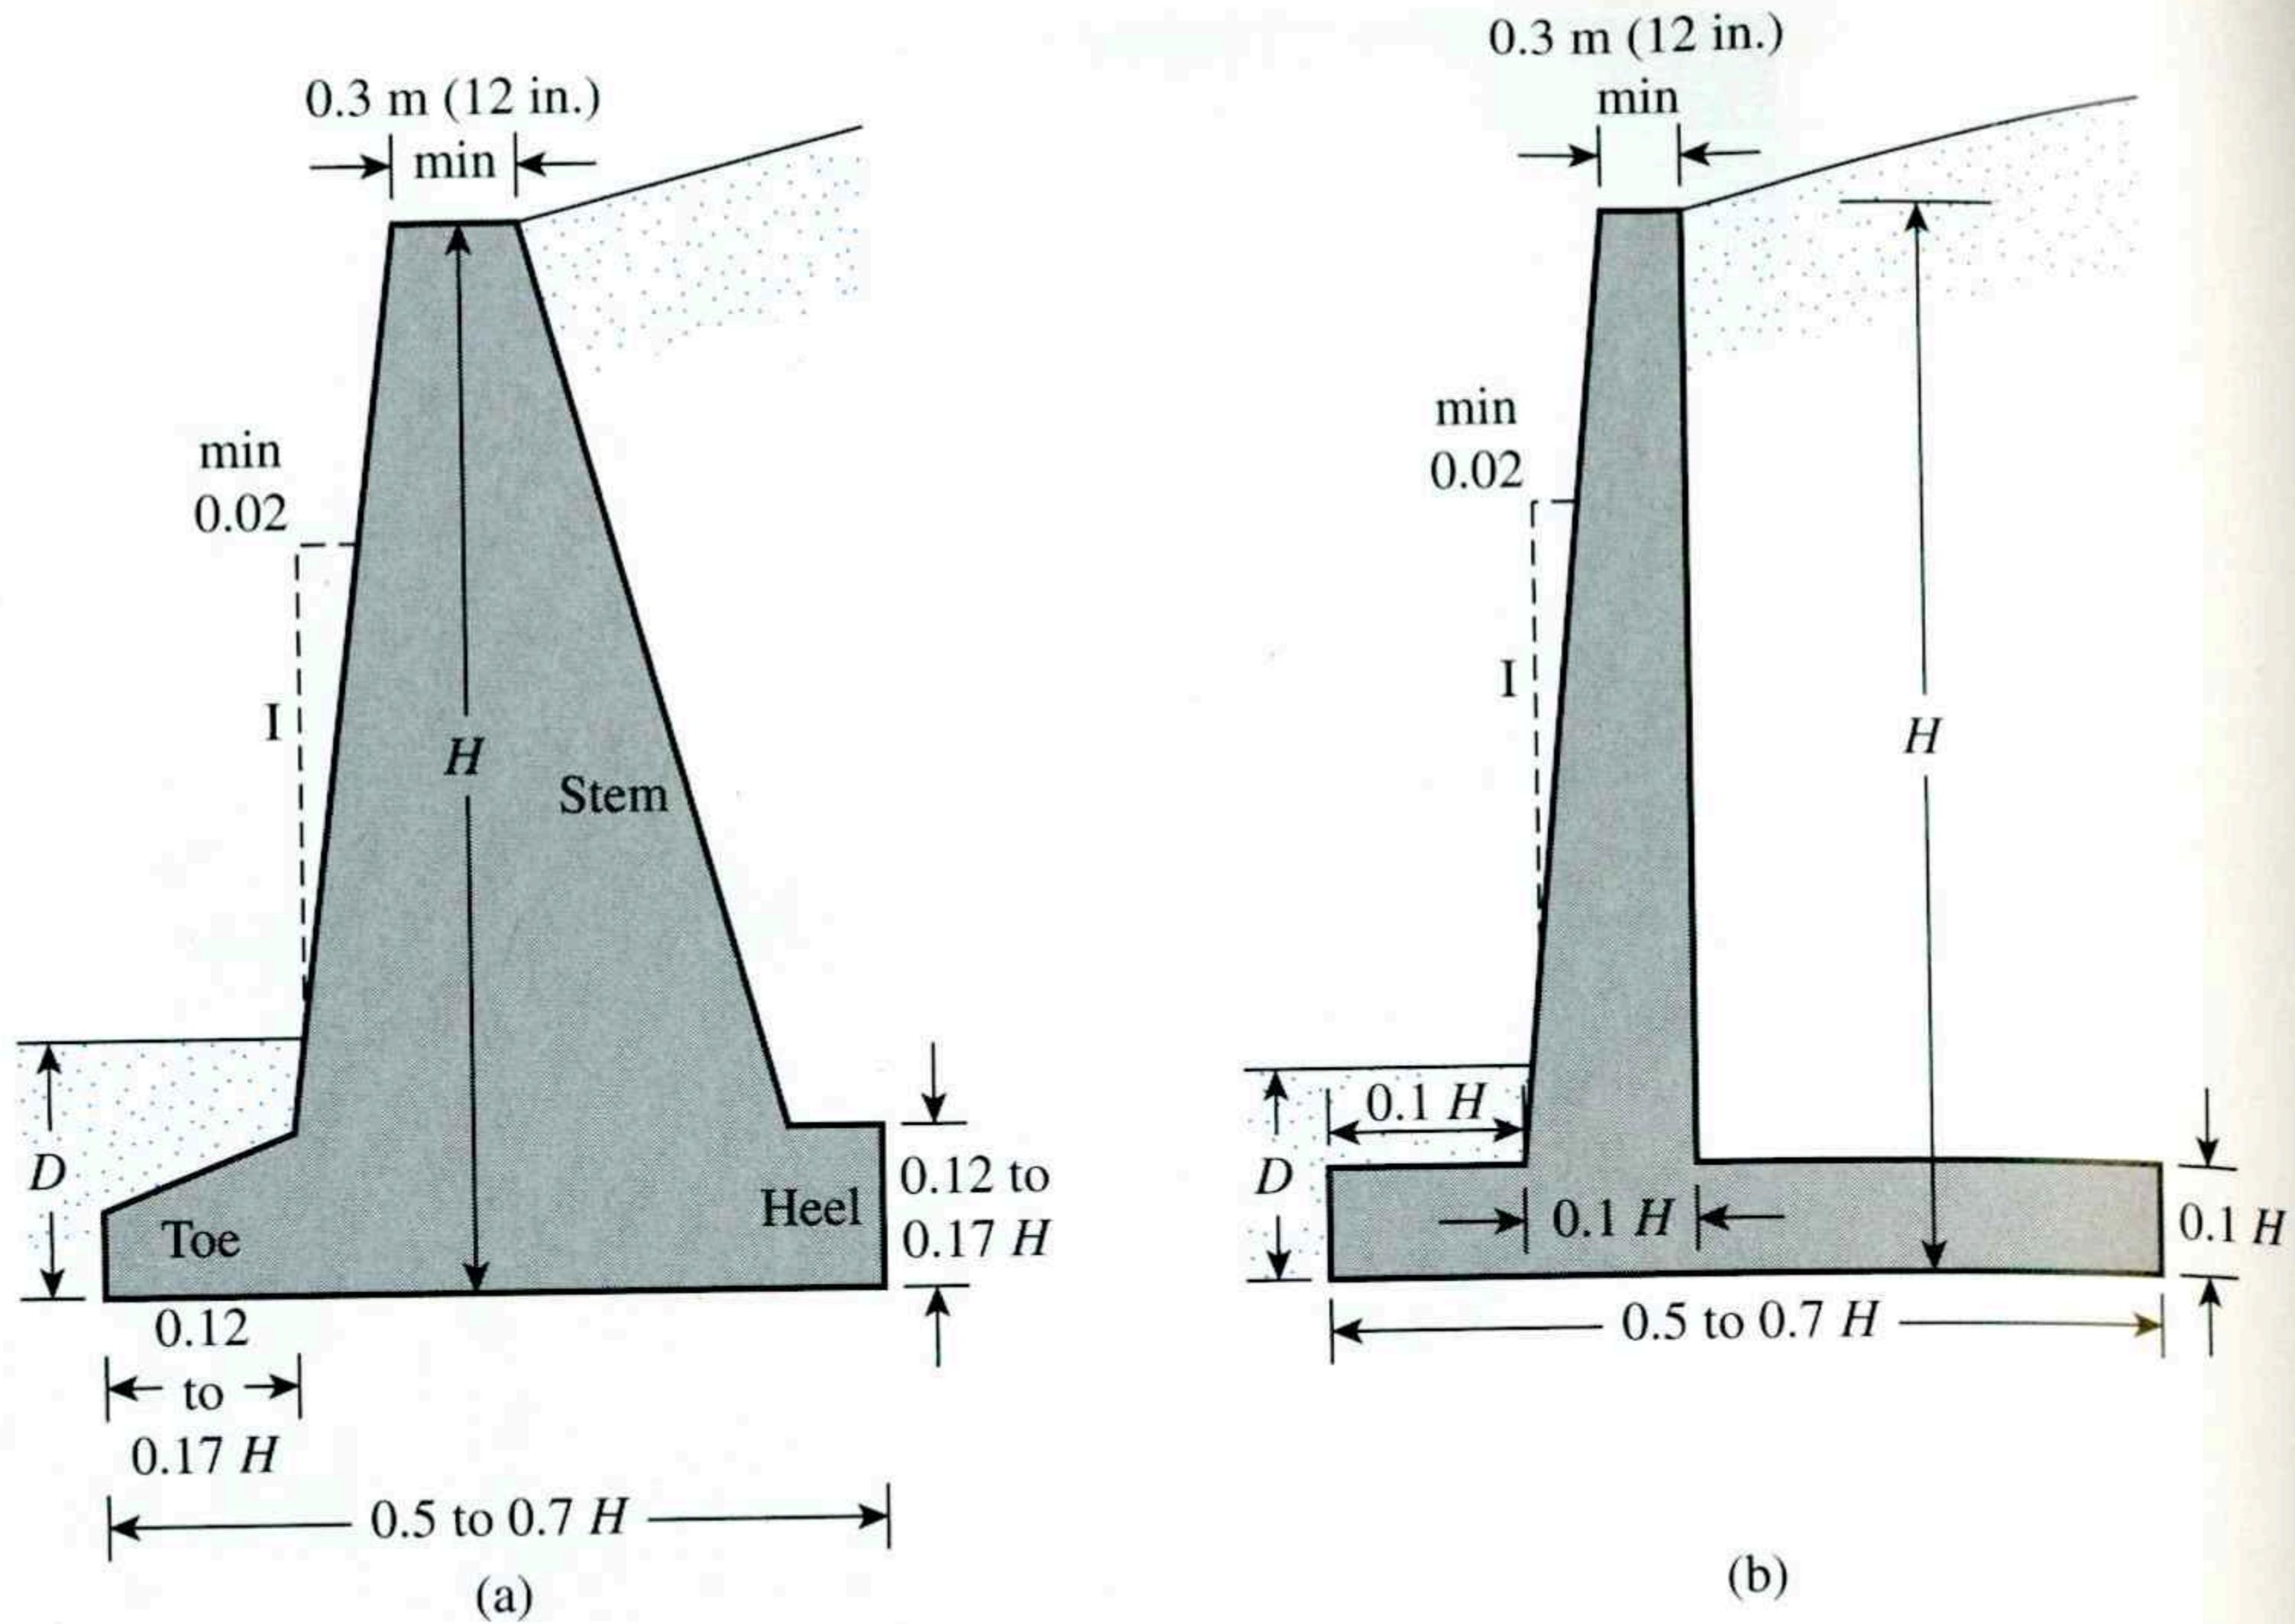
Approximate dimensions for various components of retaining wall for initial stability checks: (a) gravity wall; (b) cantilever wall
